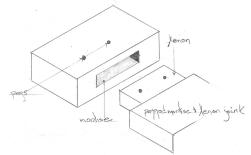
Drawing showing a typical pegged mortise and tenon joint, author's drawing.
